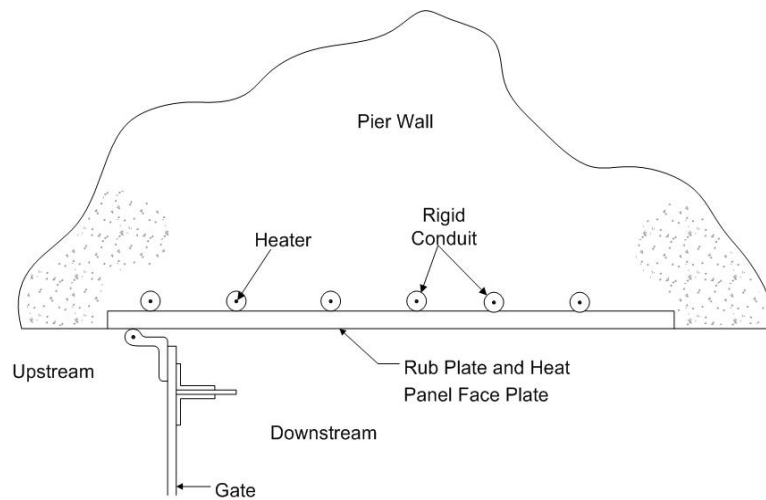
Cross-section of a heater panel embedded into a pier wall.
